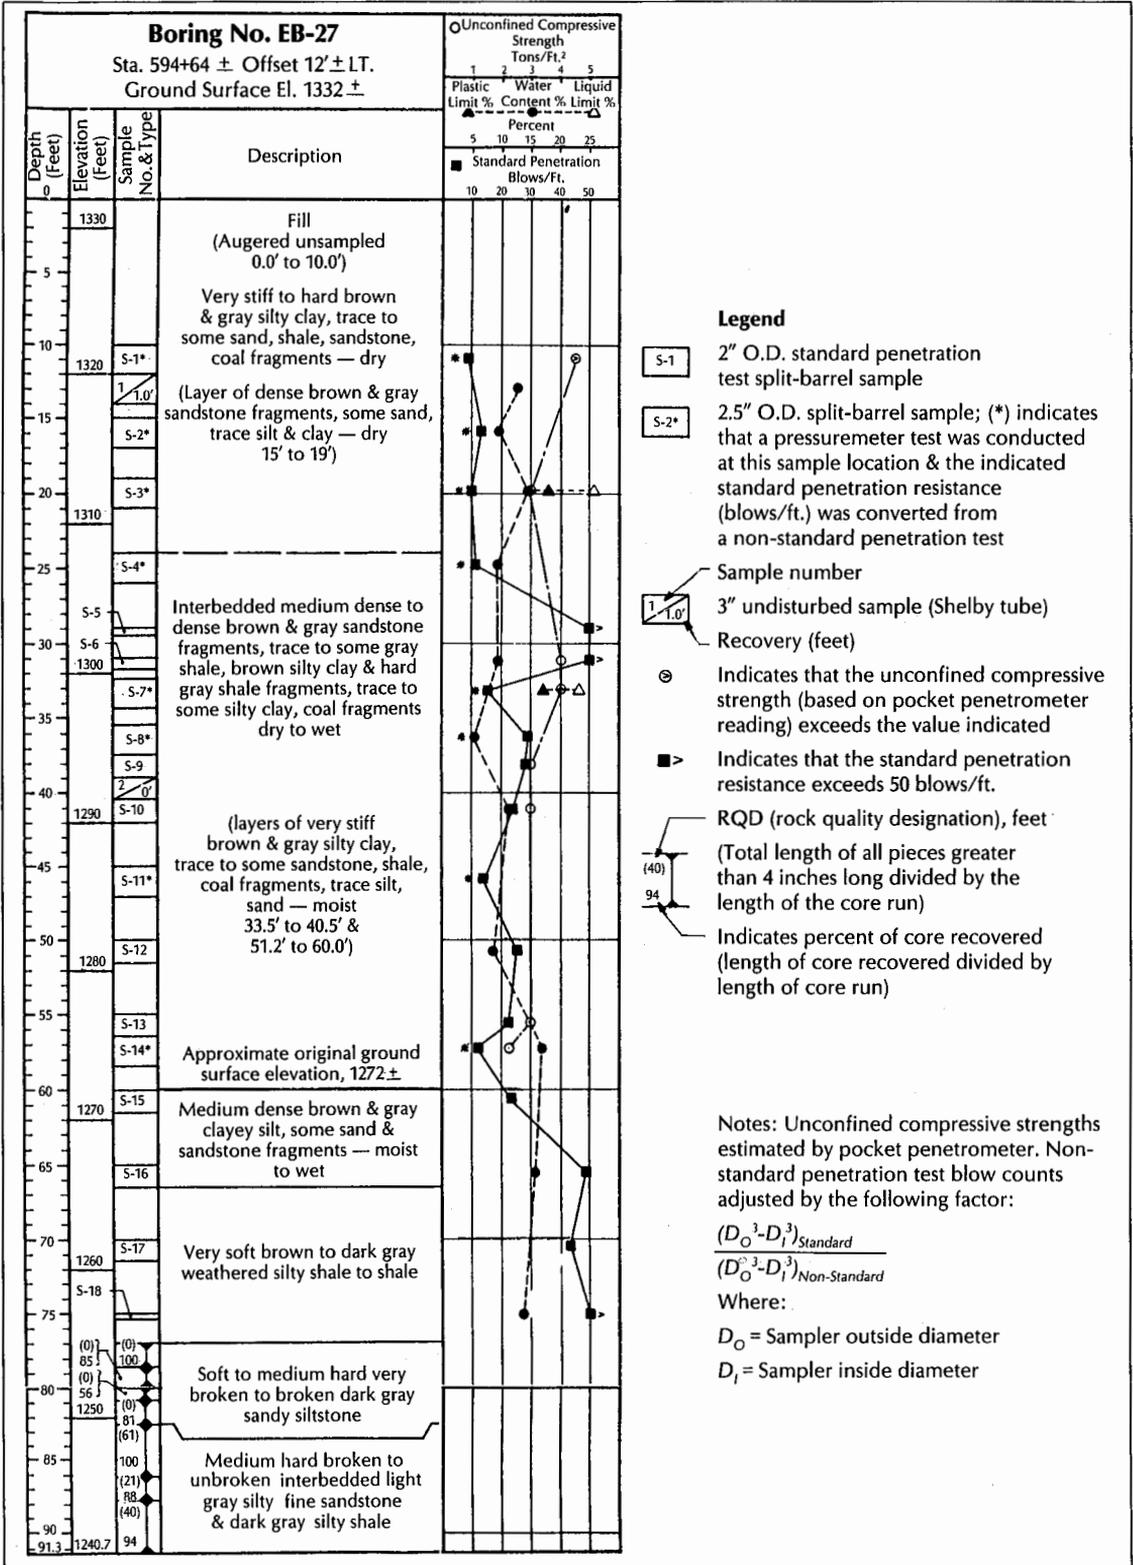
A typical boring log from the Canoe Creek Bridge evaluation.
